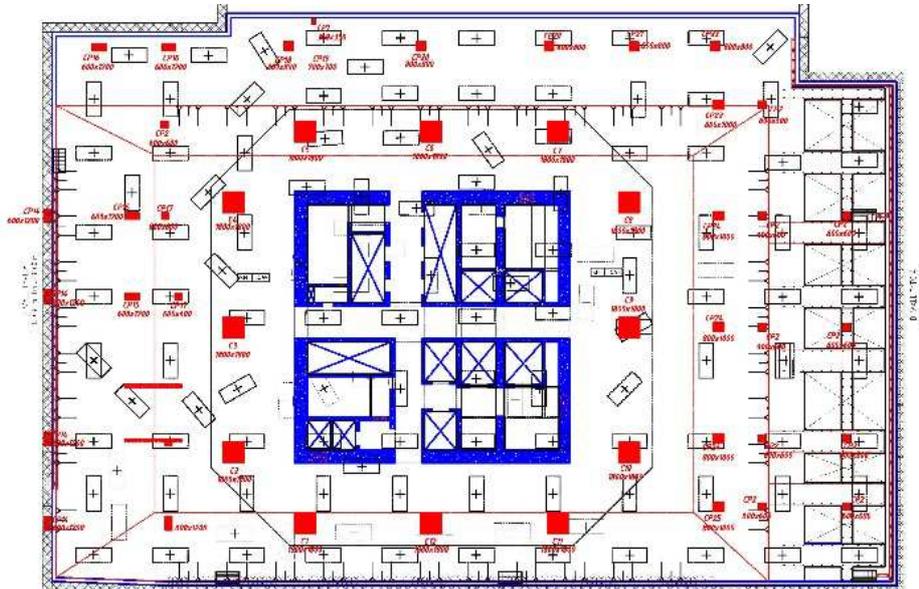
MahaNakhon mat foundations. (Source Bouygues – Thai)
